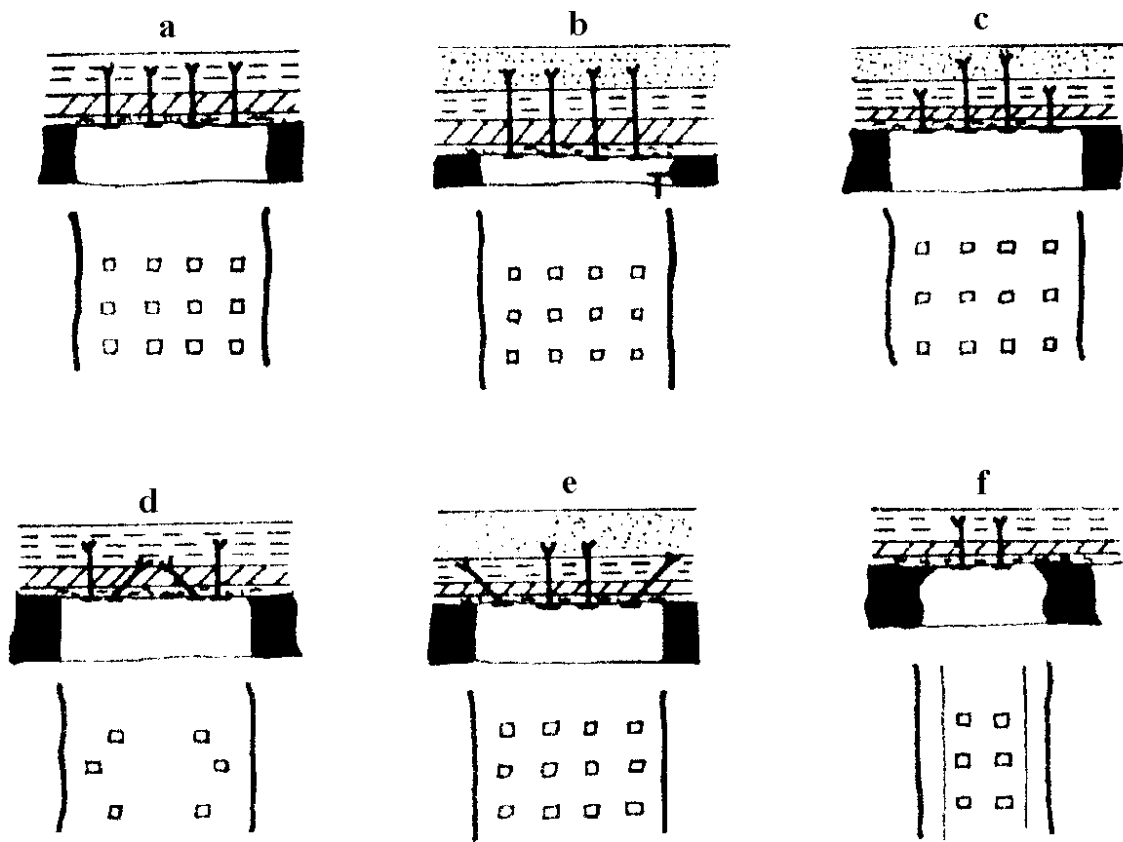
Typical roof bolting patterns (Panek and McCormick, 1973)
